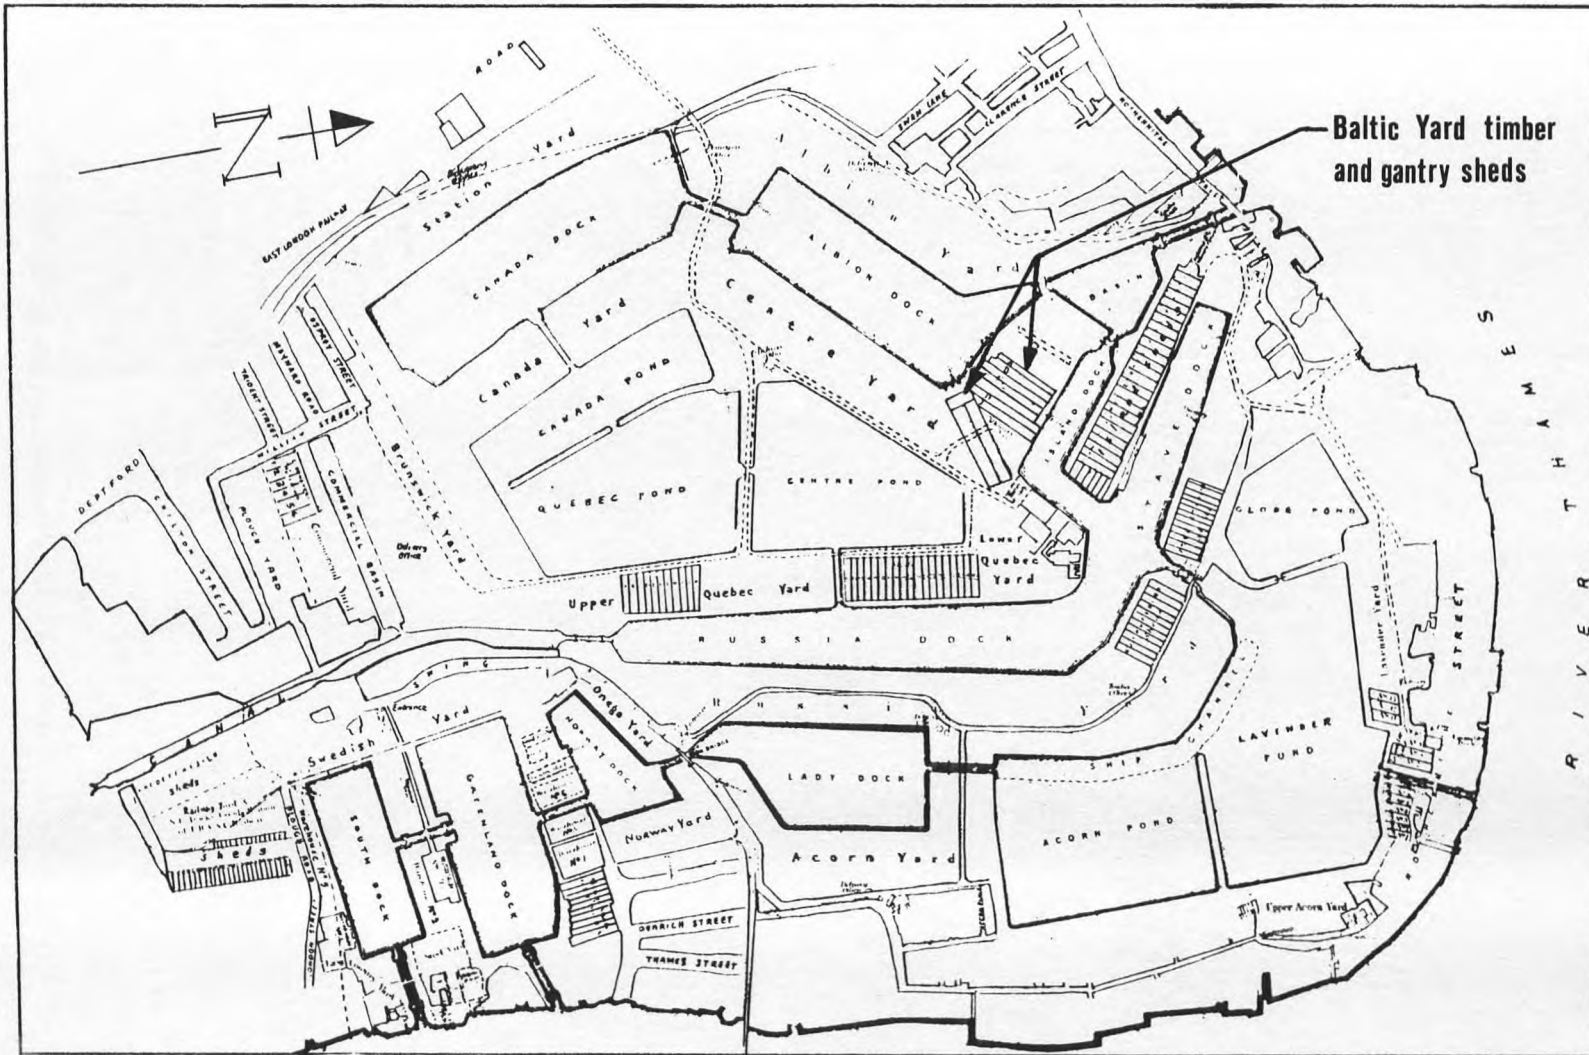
Baltic Yard timber and gantry sheds: site of the Marlow Landings development, Surrey Docks, London (source: adapted from a plan of the Surrey Commercial Docks, 1884)
